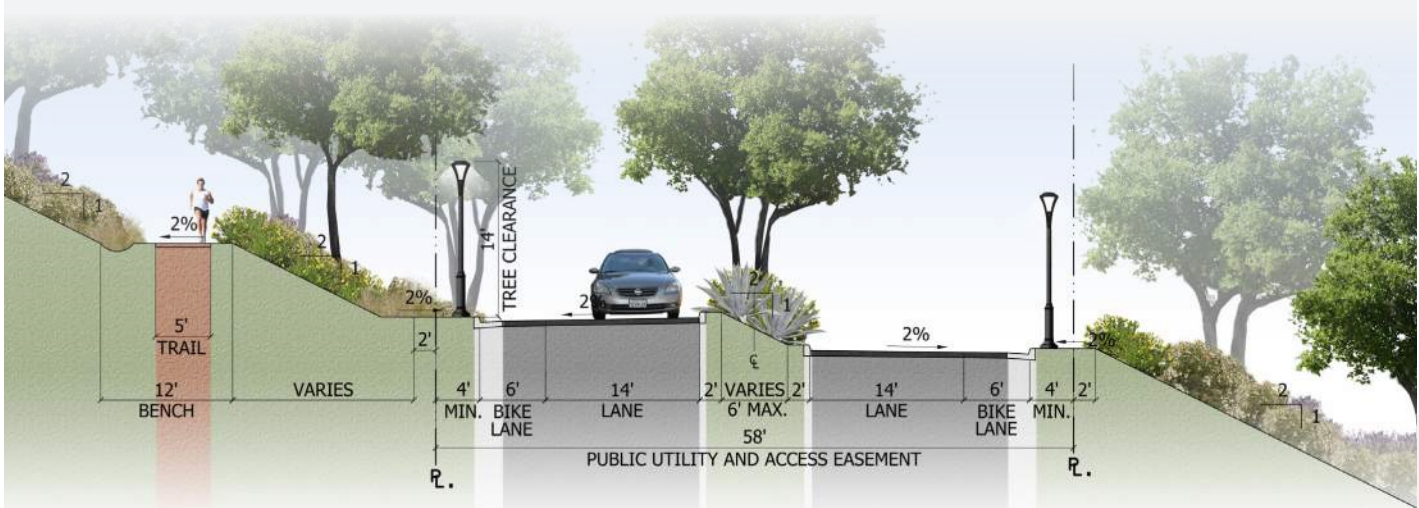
Street Section - Coromell Trail - Split Lanes (Private, TTM lot G)
